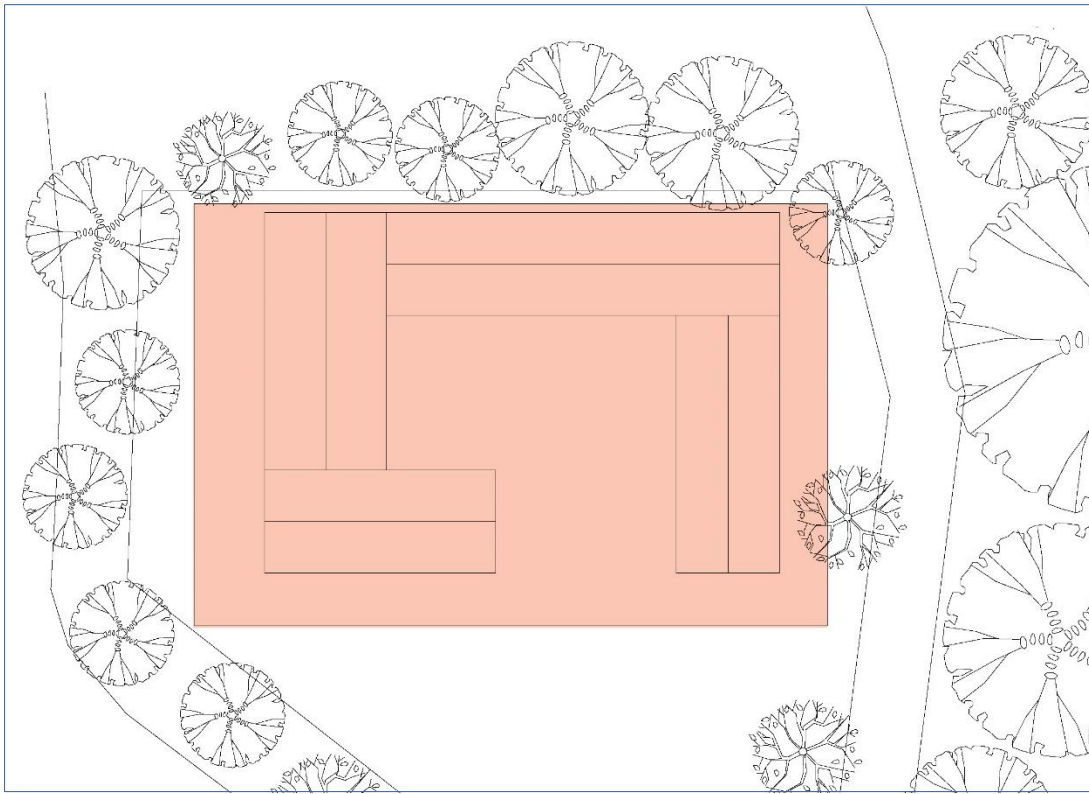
Plan view. Area highlighted in red shows available spaces for landscape design.
